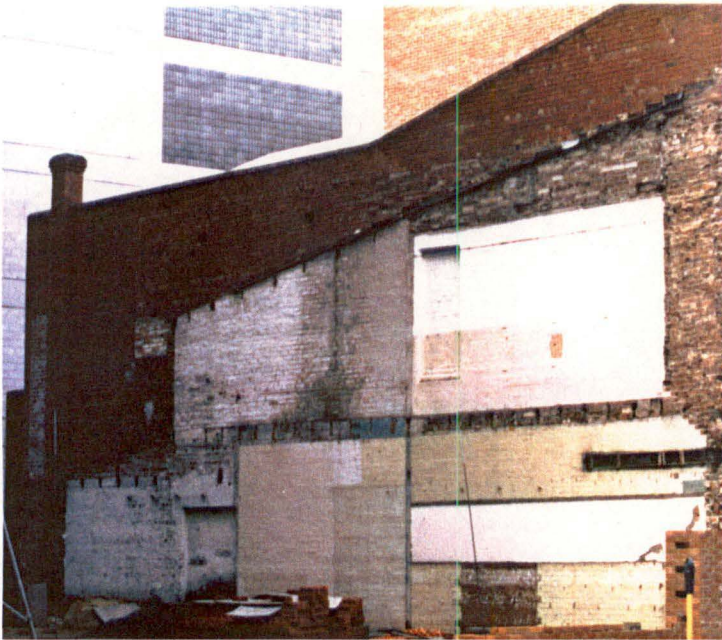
Building demolition at 23 Argyle Street has exposed the structural elements on the adjacent building
